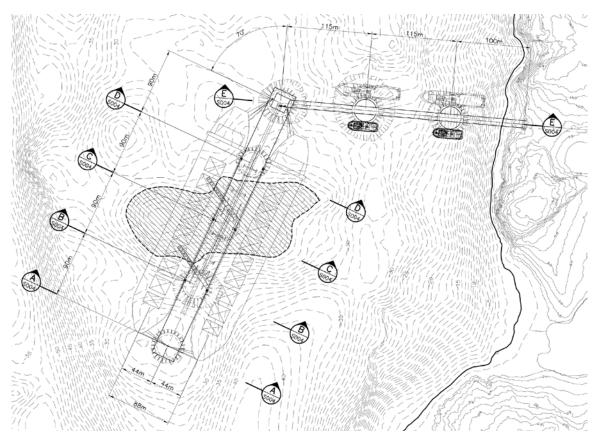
Plan, Sandwell/AMEC option for Steensby Ore Dock (see Appendix A)
